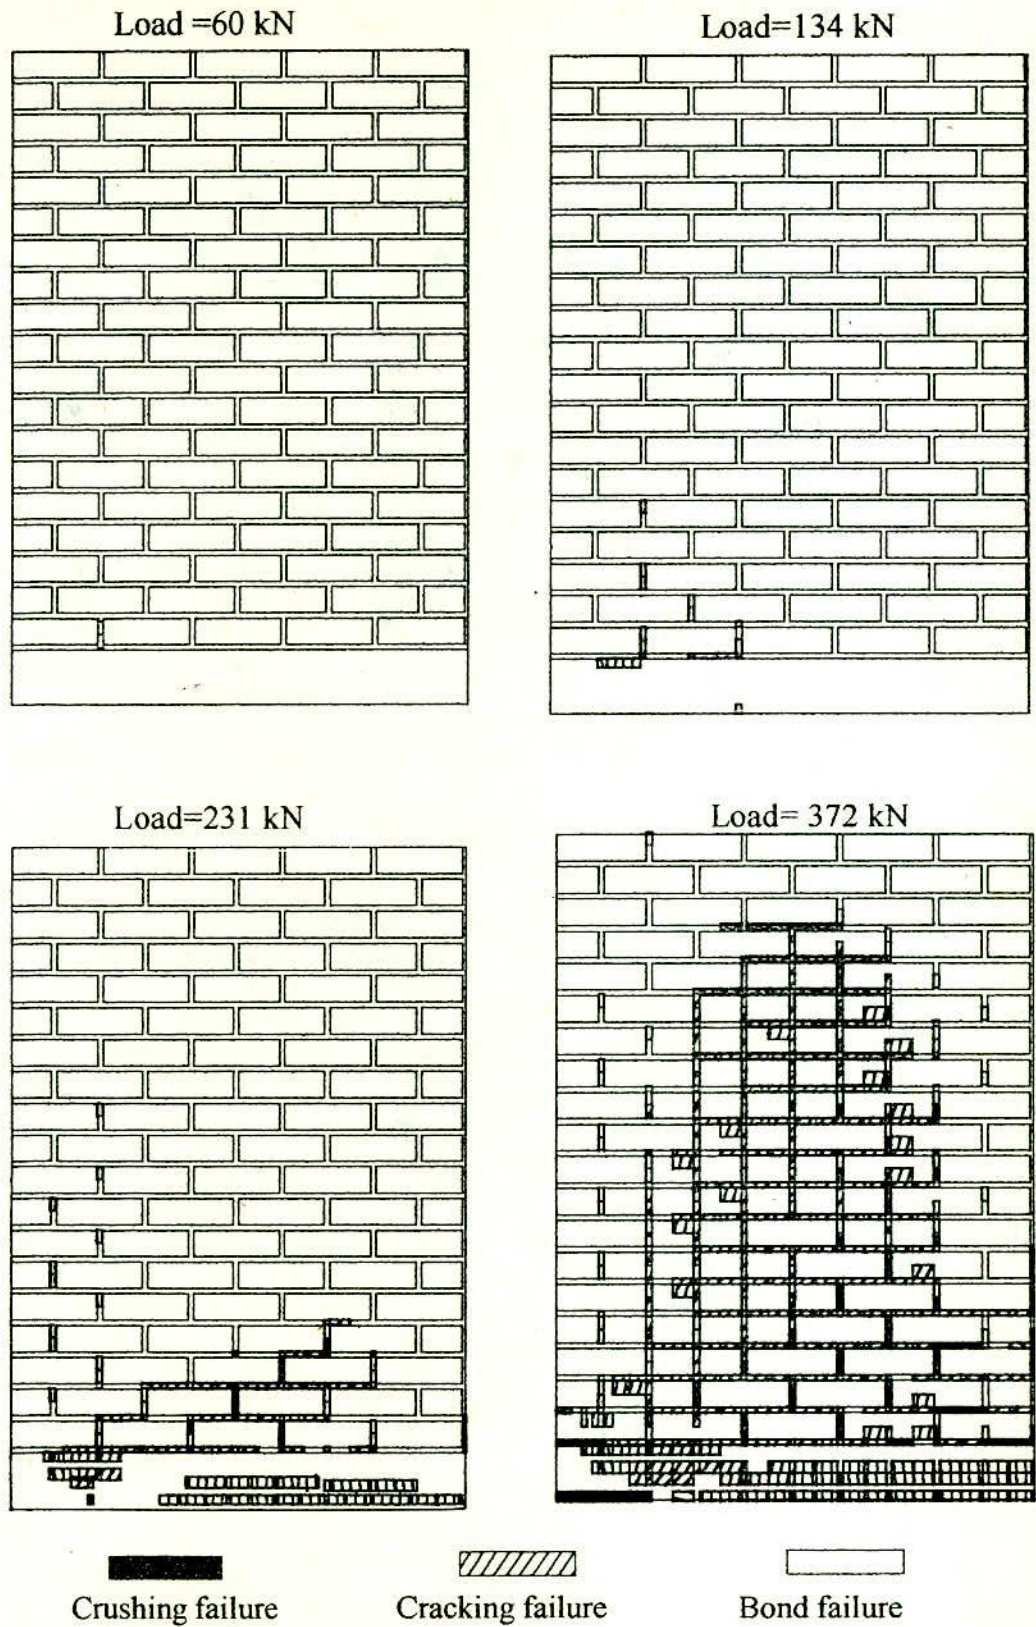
(c) Sequence of Failure of Panel (Plane Wall-beam)
